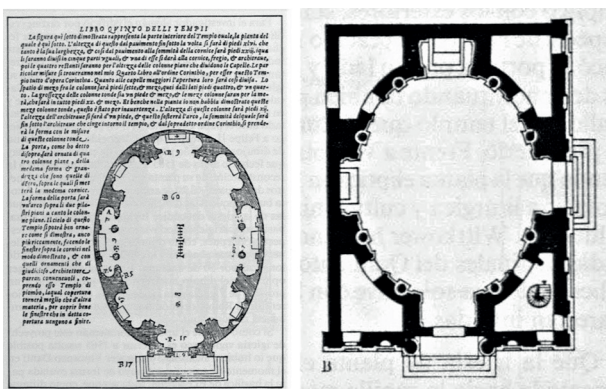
Floor plan of a Church of Serlio and Floor of the Church of Santa Ana dei Palafrenieri by Vignola.<sup>7</sup>
